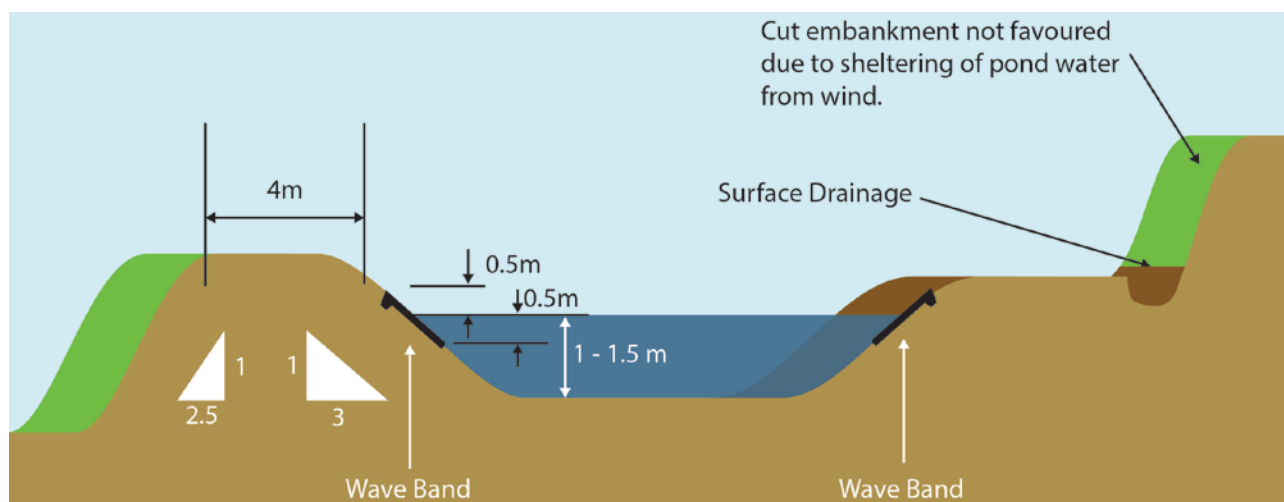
Typical pond construction for cut and fill earthworks construction
